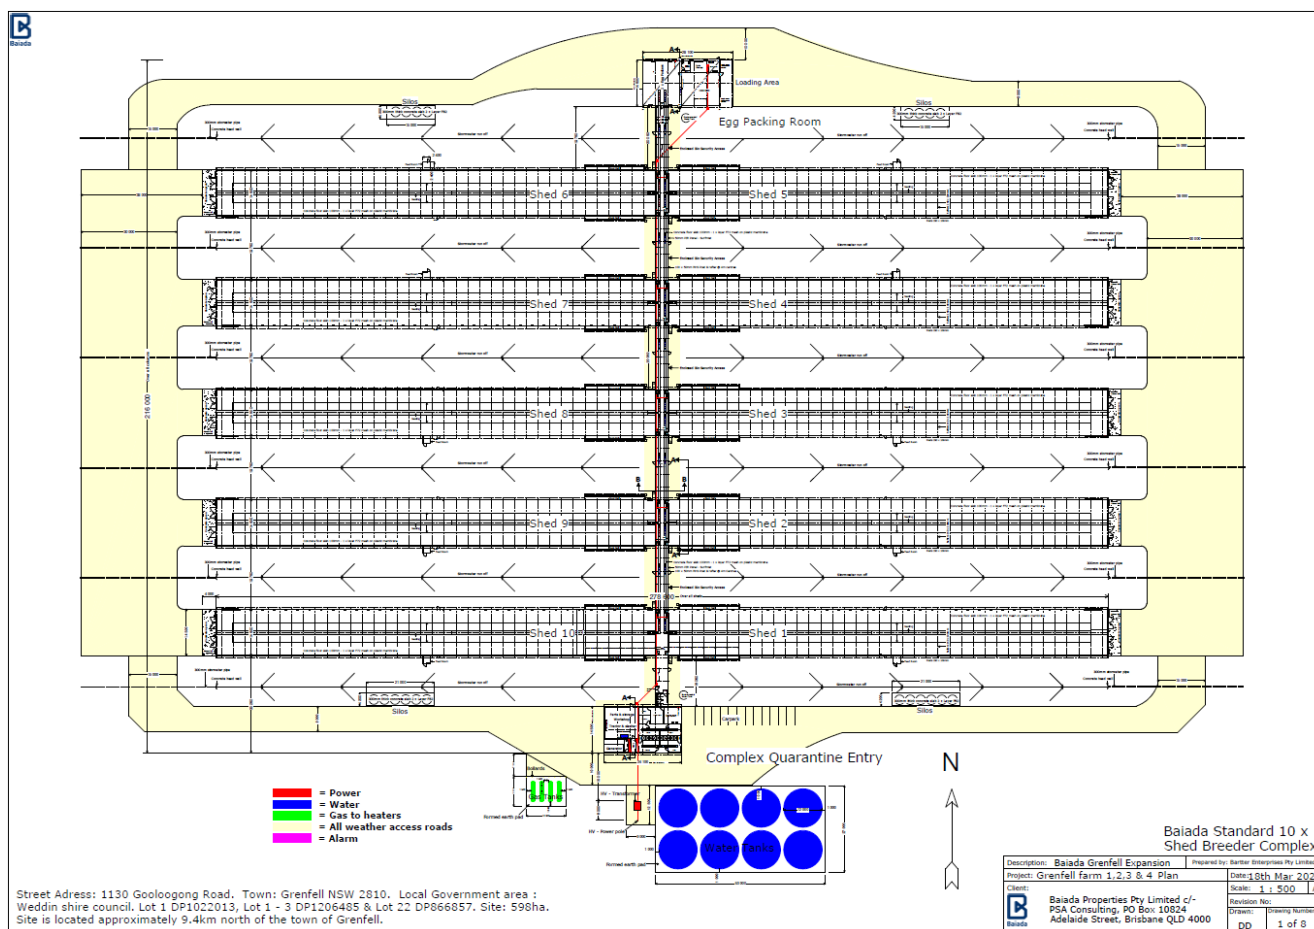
Site Layout Plan (MPN Consulting, 2021)
